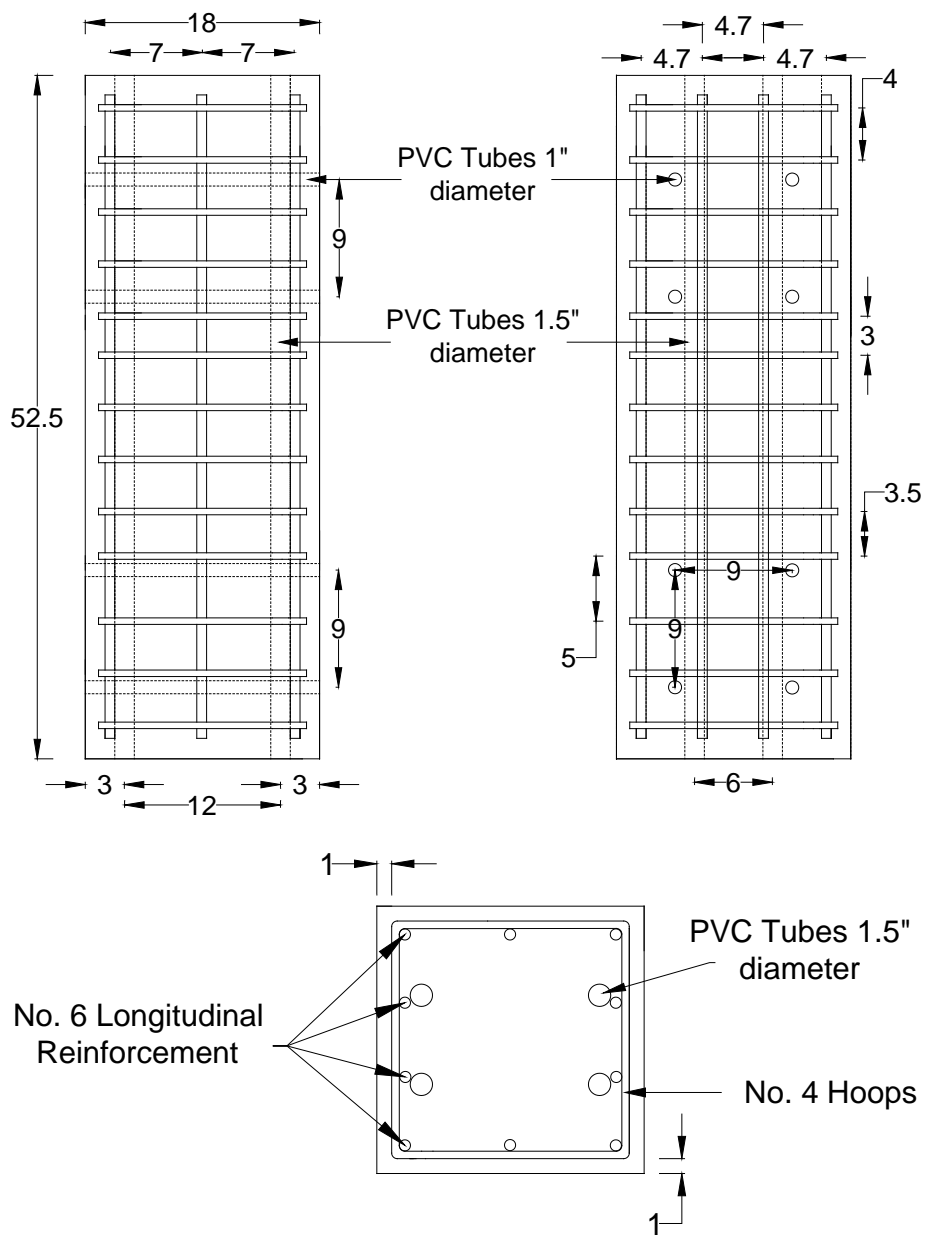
Small block reinforcement detailing for CB-4 (all dimensions in inches)
